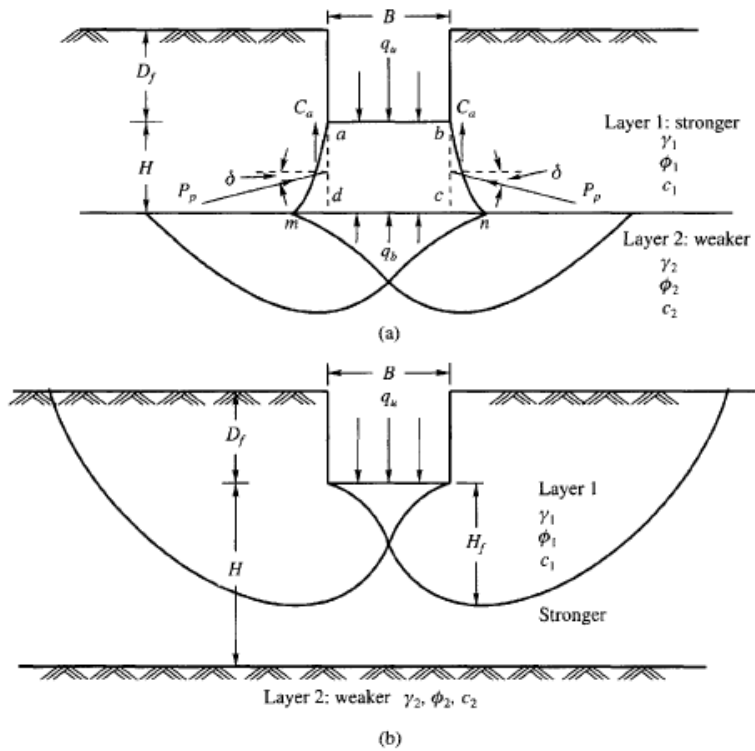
Failure of soil below strip footing under vertical load on strong layer overlying weak deposit (after Meyerhof and Hanna, 1978)
